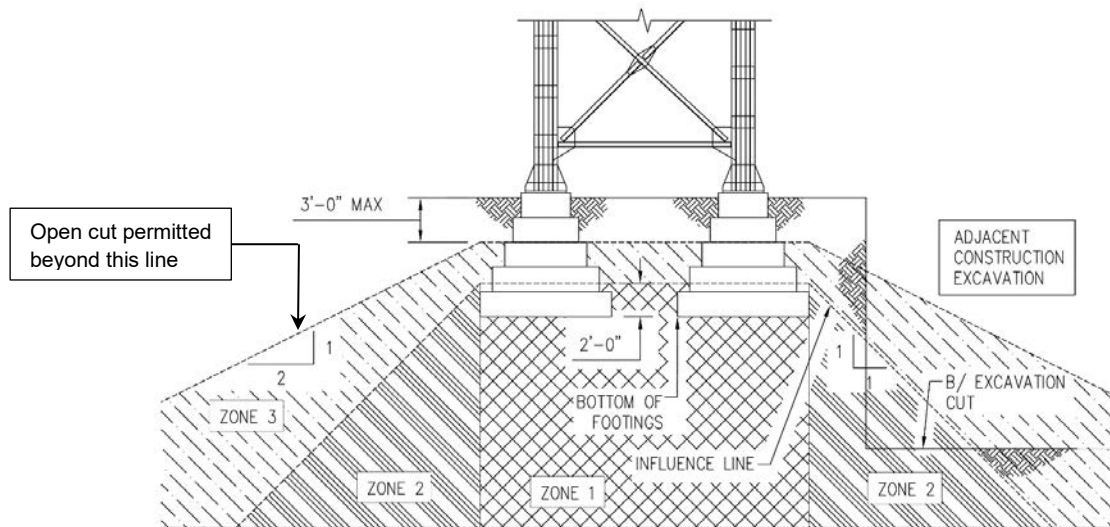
4: Elevated Track Structure Footing Zone of Influence
